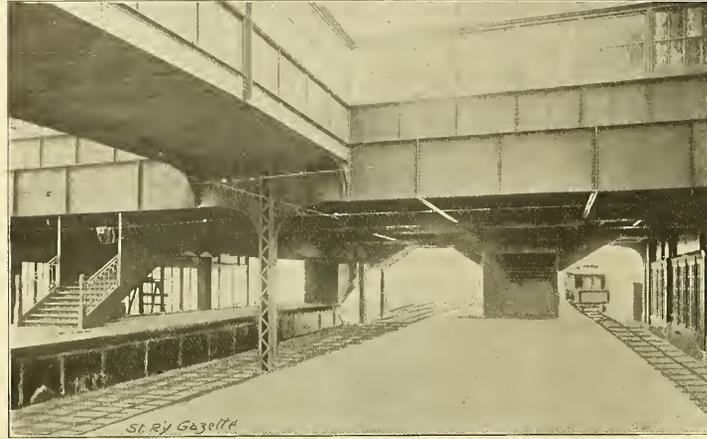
SECOND STORY OF TERMINAL BUILDING, SHOWING BRIDGE RAILWAY TRACKS AND PLATFORMS.
